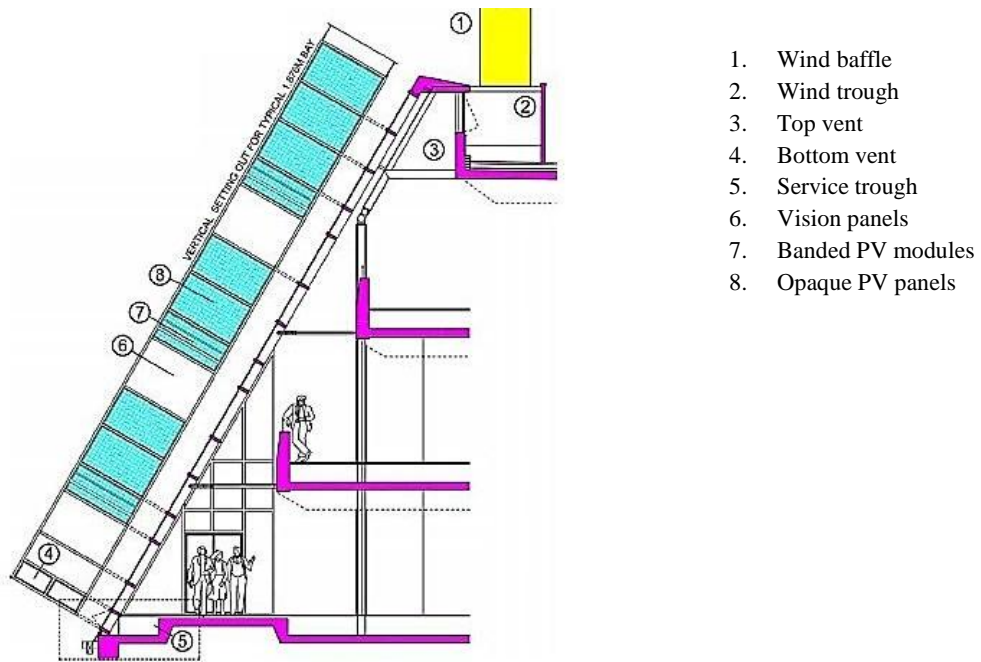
Detailed section through solar façade and single bay in elevation (Prasad and Mark, 2005).
